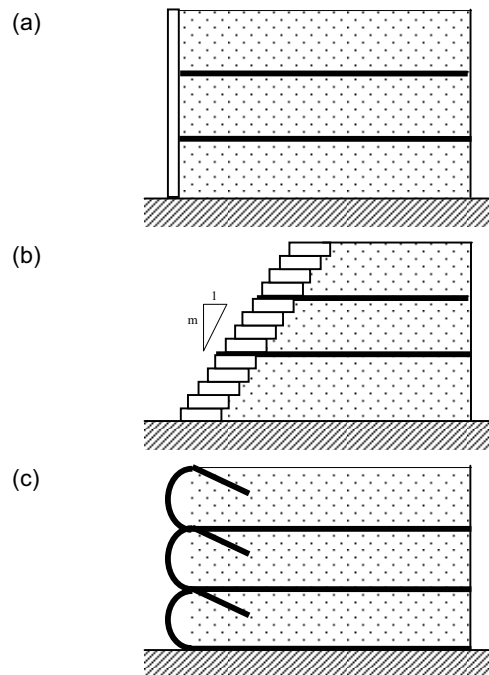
Typical Facings in RGS-RW: (a)Panel Facing; (b)Segmental Facing; (c) Wrapped Facing
